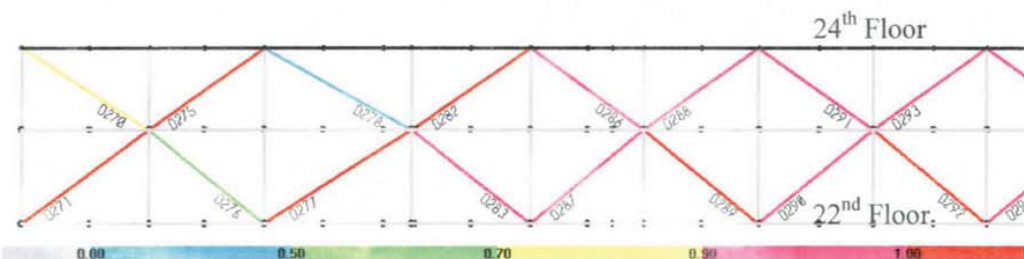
North Belt Truss diagonal diagram (Building east side magnified)
